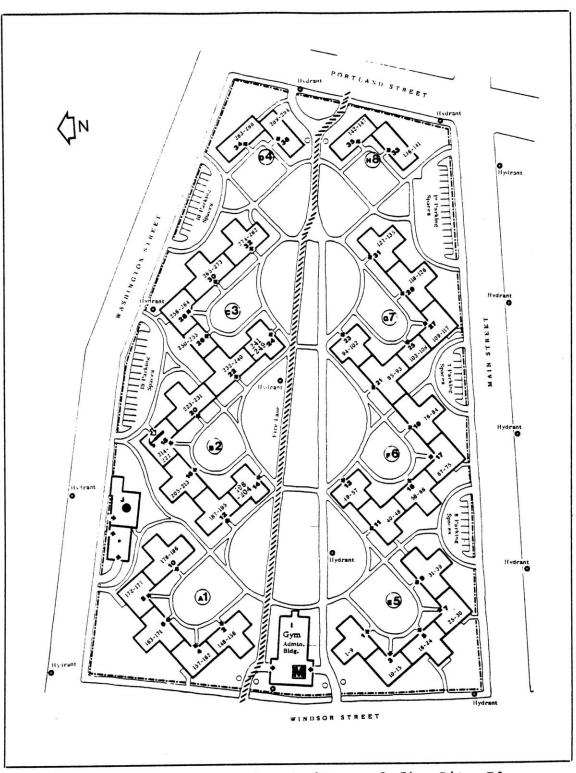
New Towne Court (Mass. 3-5), Site Plan. (Source: Cambridge Housing Authority.)
